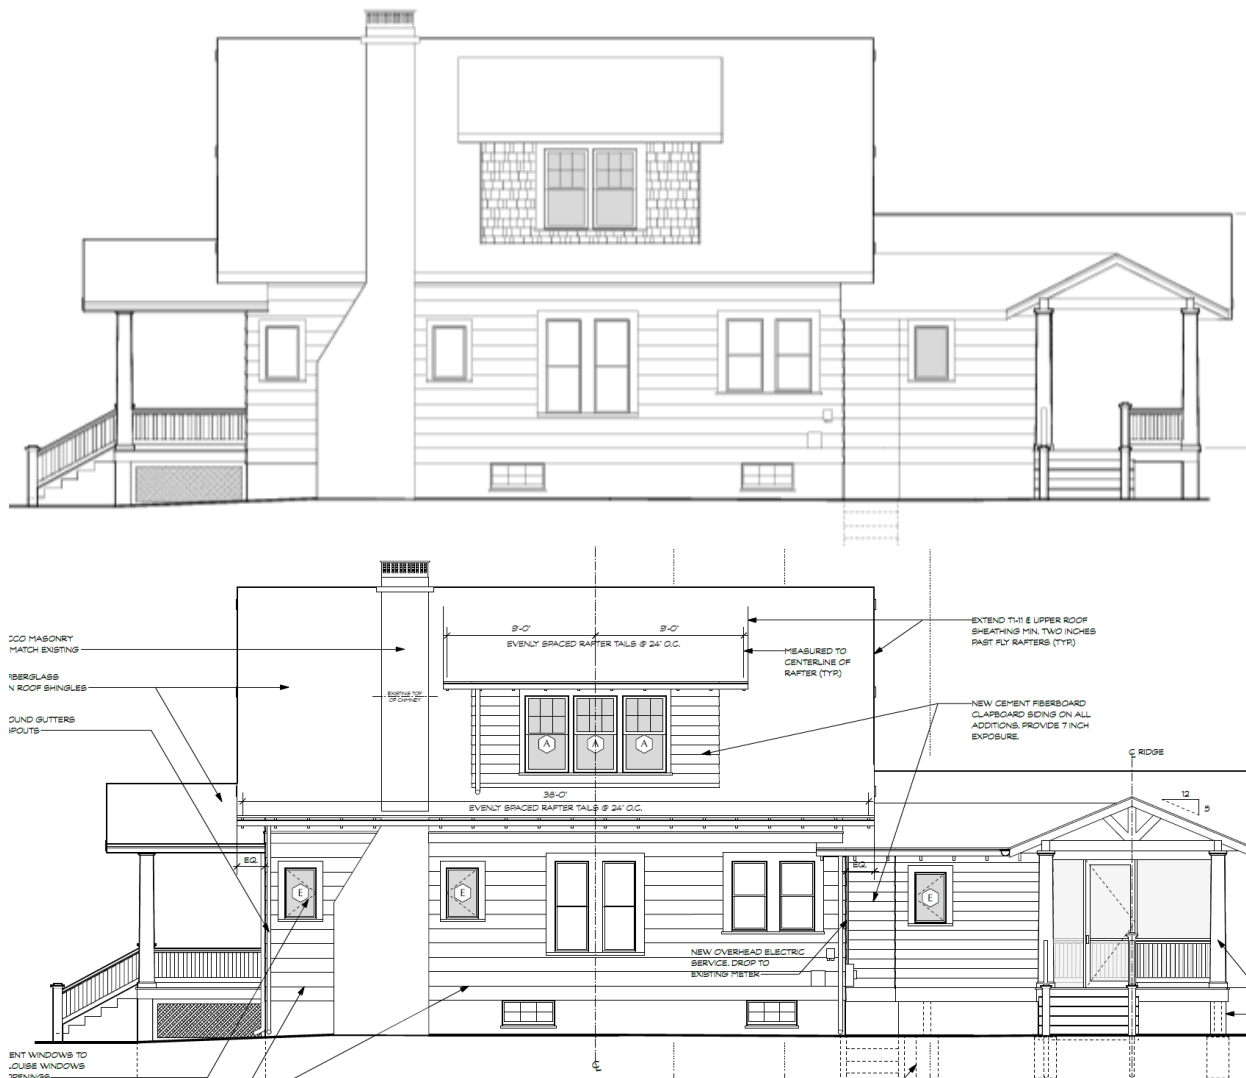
West elevation comparing the previous approval (above) to the proposed revision (below).
